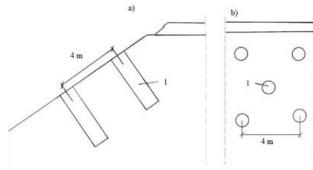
Stabilization diagram of embankment sloping parts by introducing reinforcing additives: 1 – soil reinforced masses; a) – cross section; b) – longitudinal section
